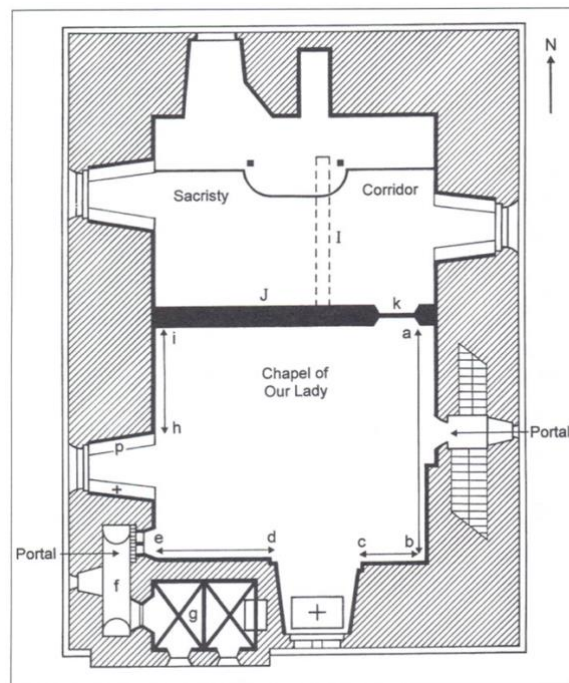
Floor Plan of the Chapel of the Virgin Mary
